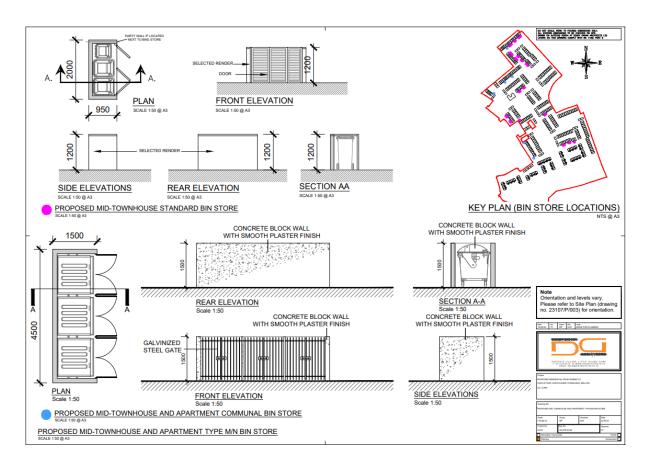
Mid-Townhouses and Type M & N Apartments/ Duplex Bin Storage
